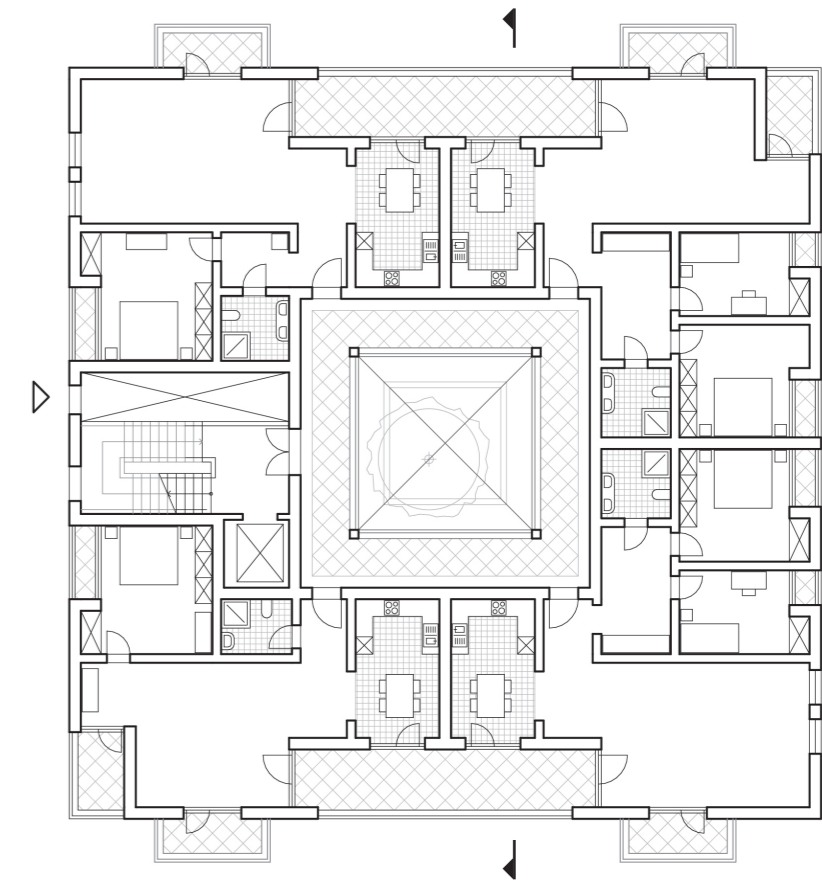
Exemplary floorplan for a residential building with climatic adaptations, rooted in the traditional Beirut architecture.
